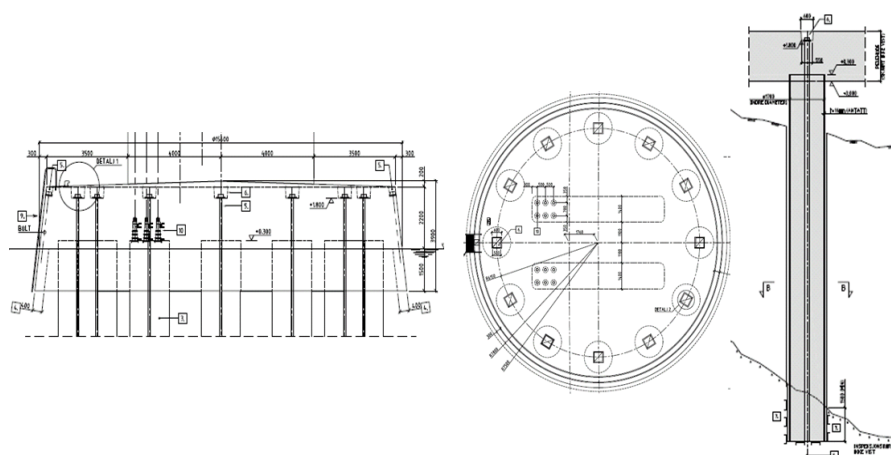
Tverlandsbrua: axis 2: foundation cross-section (left), foundation plan view (middle) and bored piles (right). [7]
